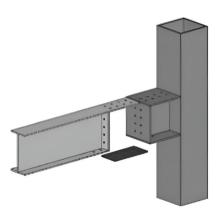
New beam-column joint with C-shaped cantilever section ■ 1. 新型带 C 形悬臂段梁柱节点
